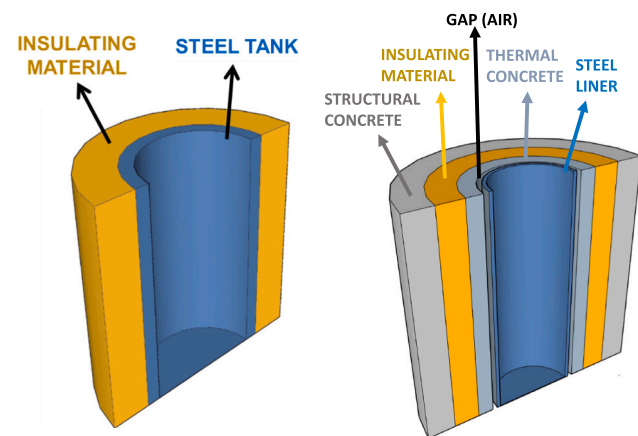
Scheme of thermocline molten salts storage concepts: left) cross-section design of conventional steel-tanks walls and right) innovative hybrid steel liner/concrete tank wall.
